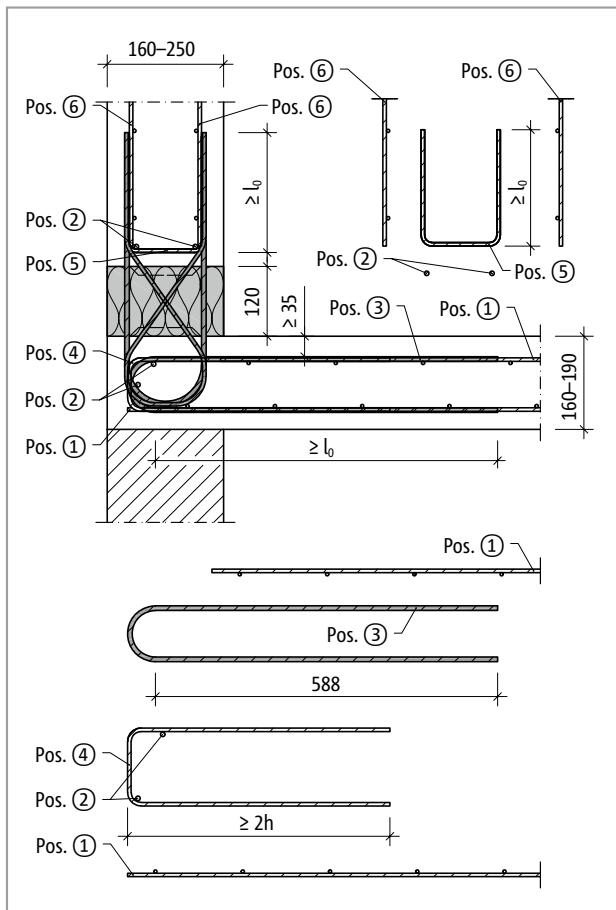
Schöck Isokorb® XT type A: On-site reinforcement inside
